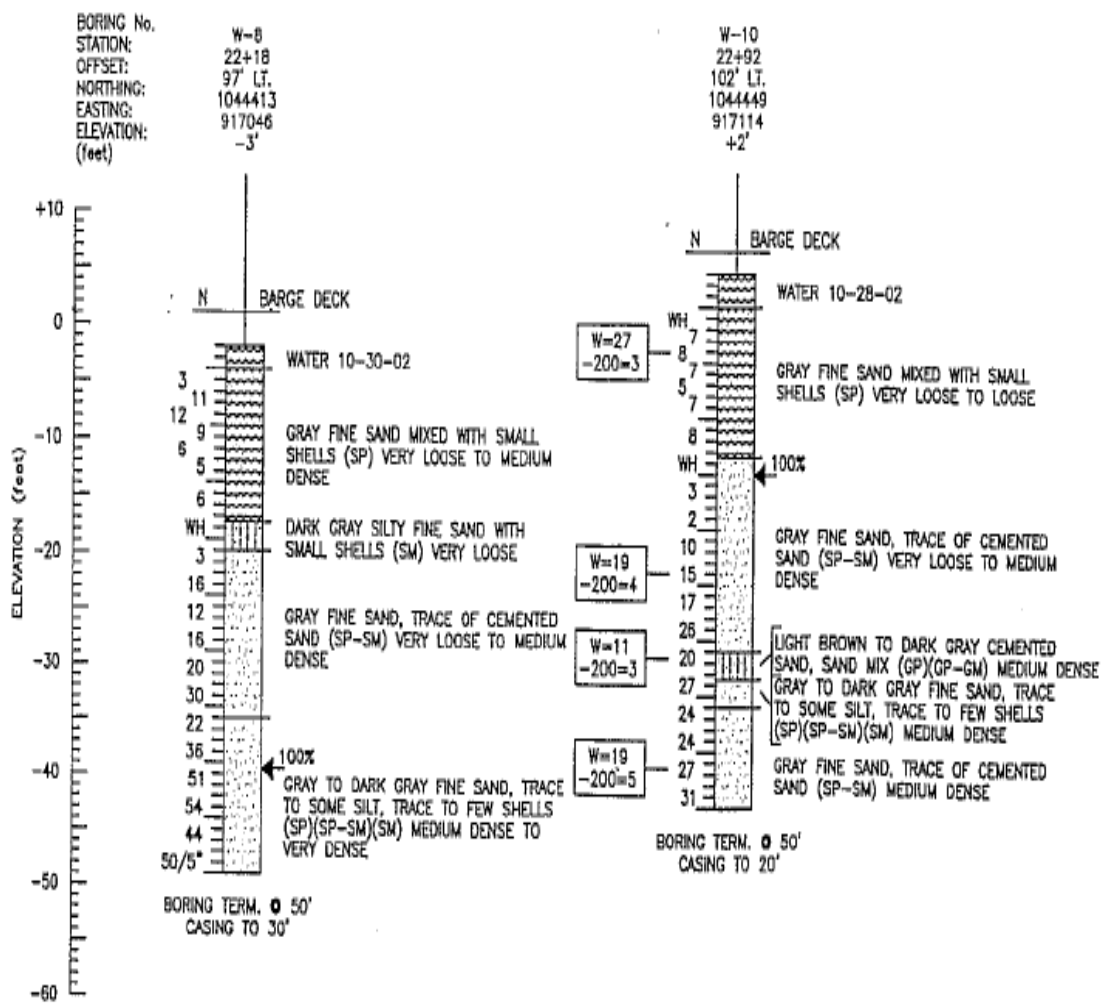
Borings "W-8" (left) and "W-10" (right) taken from bridge plans
